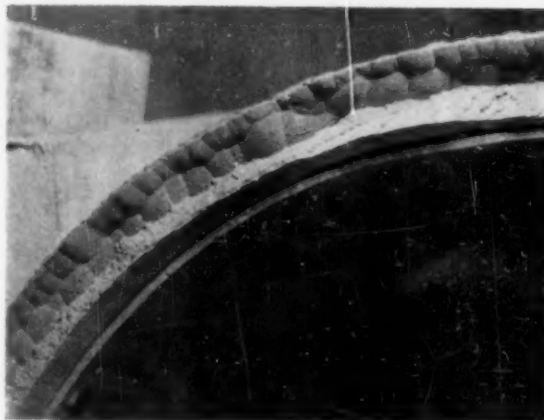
DETAILED VIEW OF TEST SPECIMEN AFTER FRACTURE
